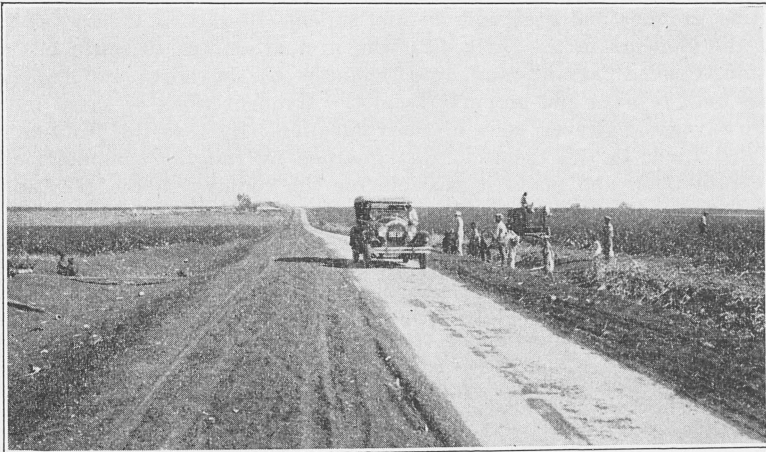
Single track concrete road in Rockwall County. These roads are 8 feet wide and built at a cost of slightly above \$11,000 per mile. This makes it possible to build many more miles of road on a limited amount of money than would be possible were a standard road built. By this policy many more farmers are reached. (Courtesy Portland Cement Association).
